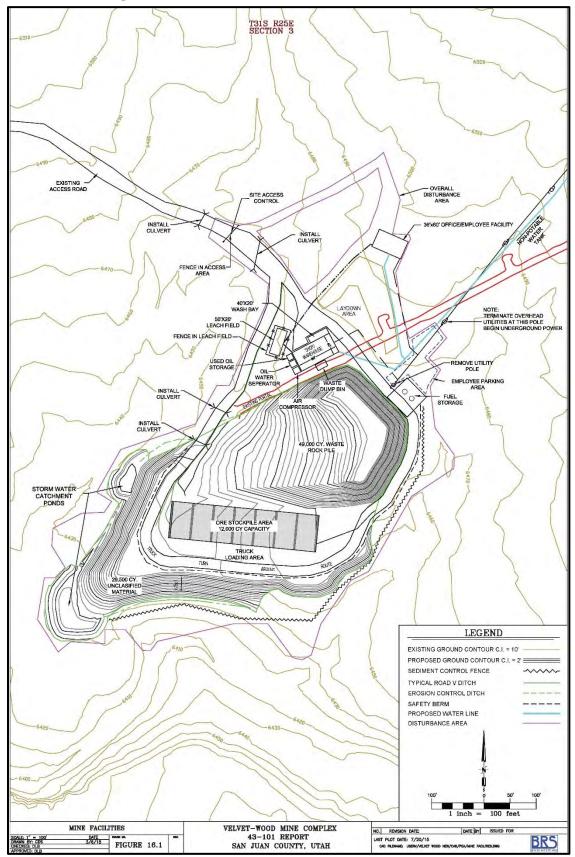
Velvet-Wood Mine Surface Facilities Plan
